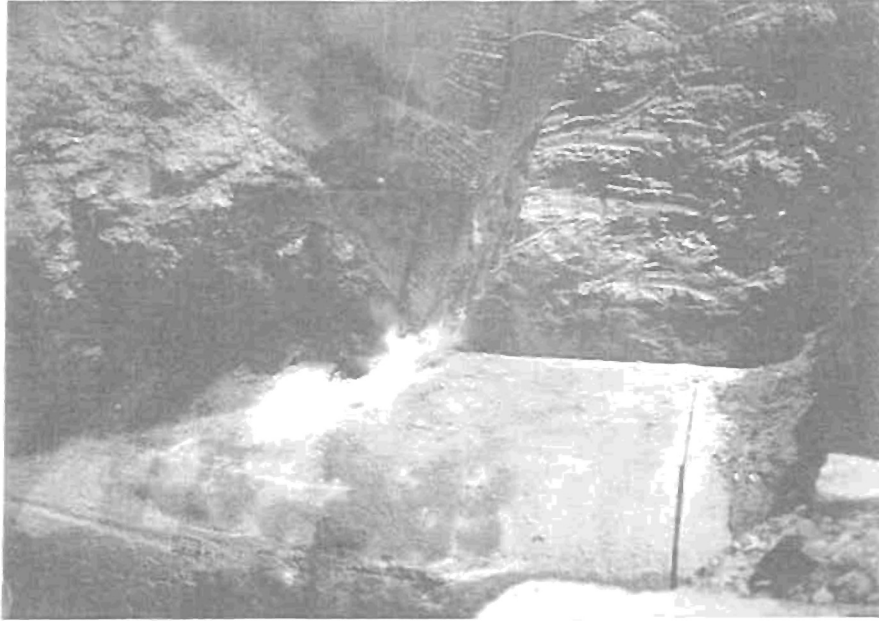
After cutting pipe a back-hoe was used to break out a section of pipe where the manhole was to be placed.
